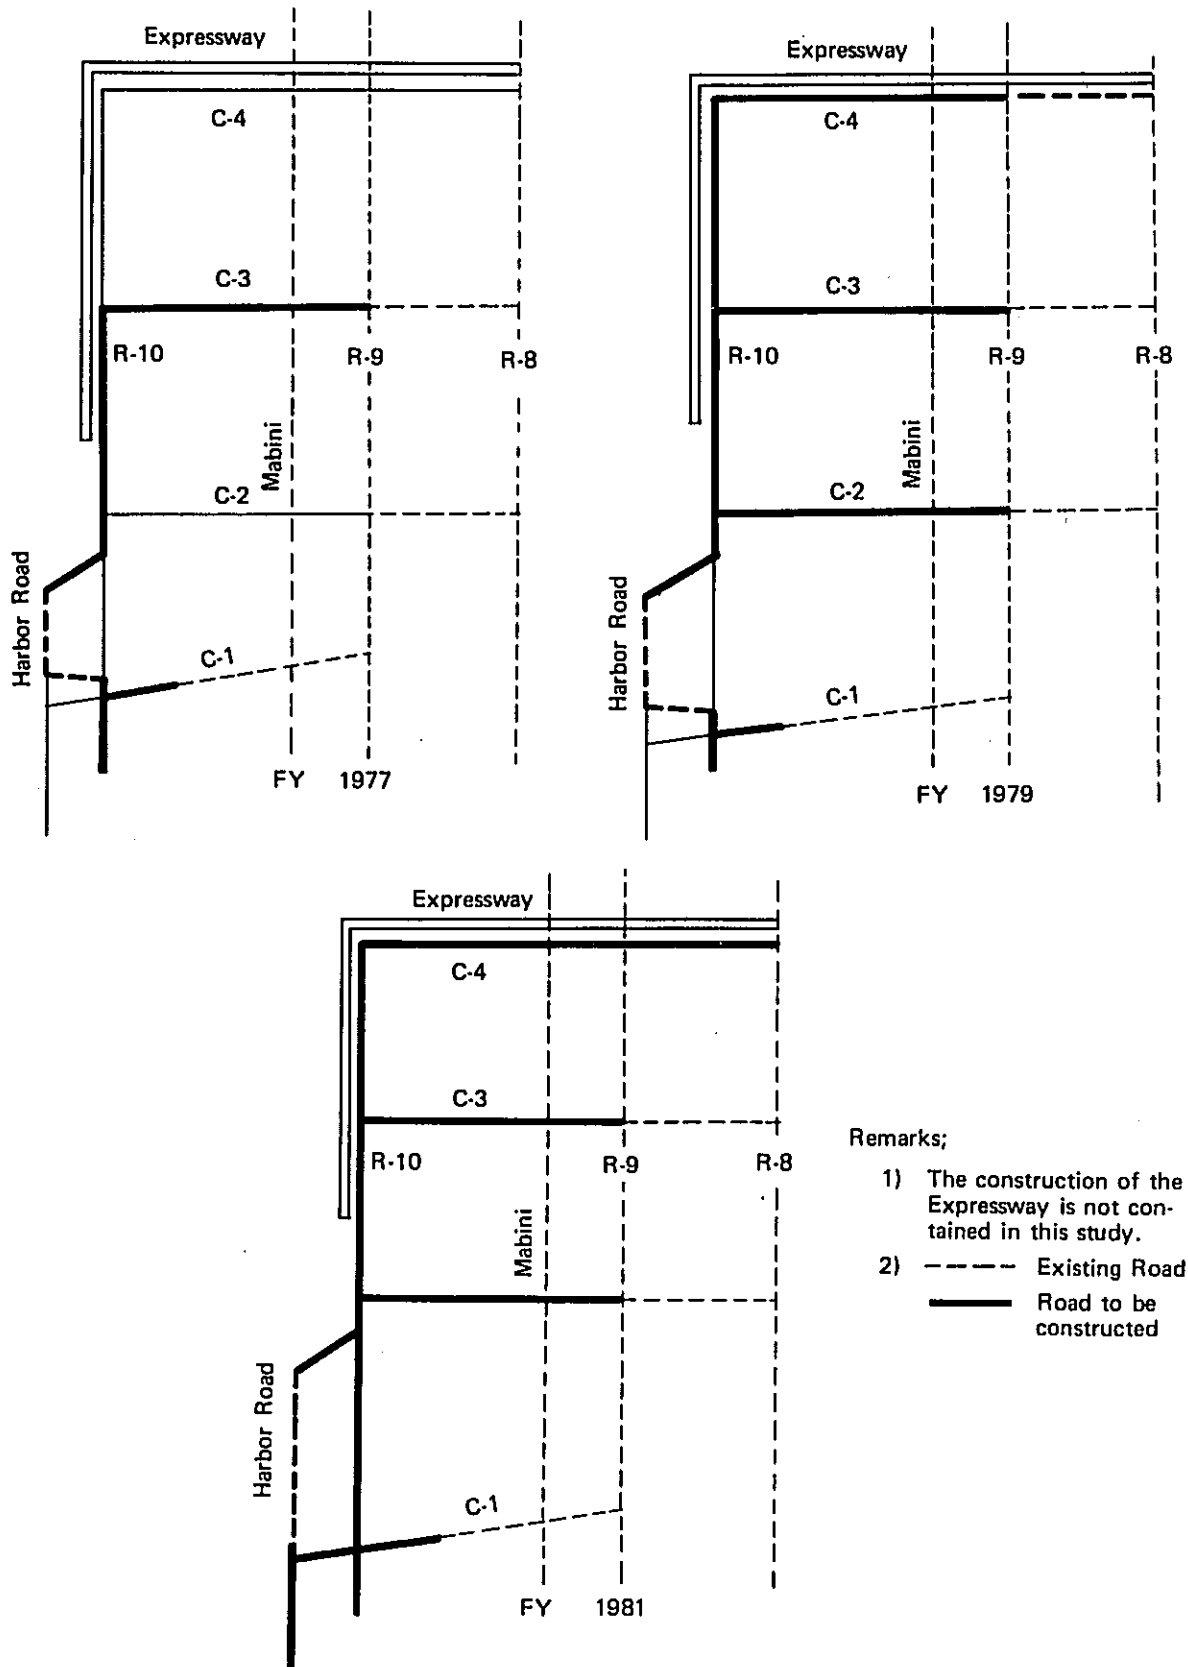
STAGE CONSTRUCTION PLAN OF PROJECT ROADS
